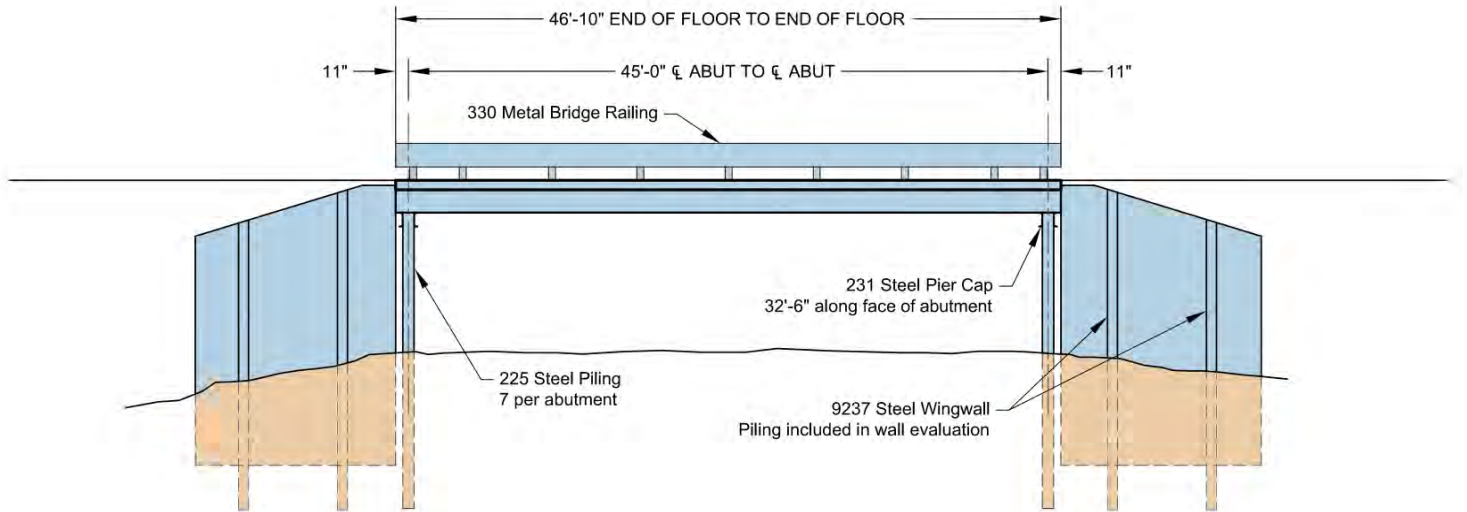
EI-24.8- 1: Elevation view of simple span steel girder bridge
